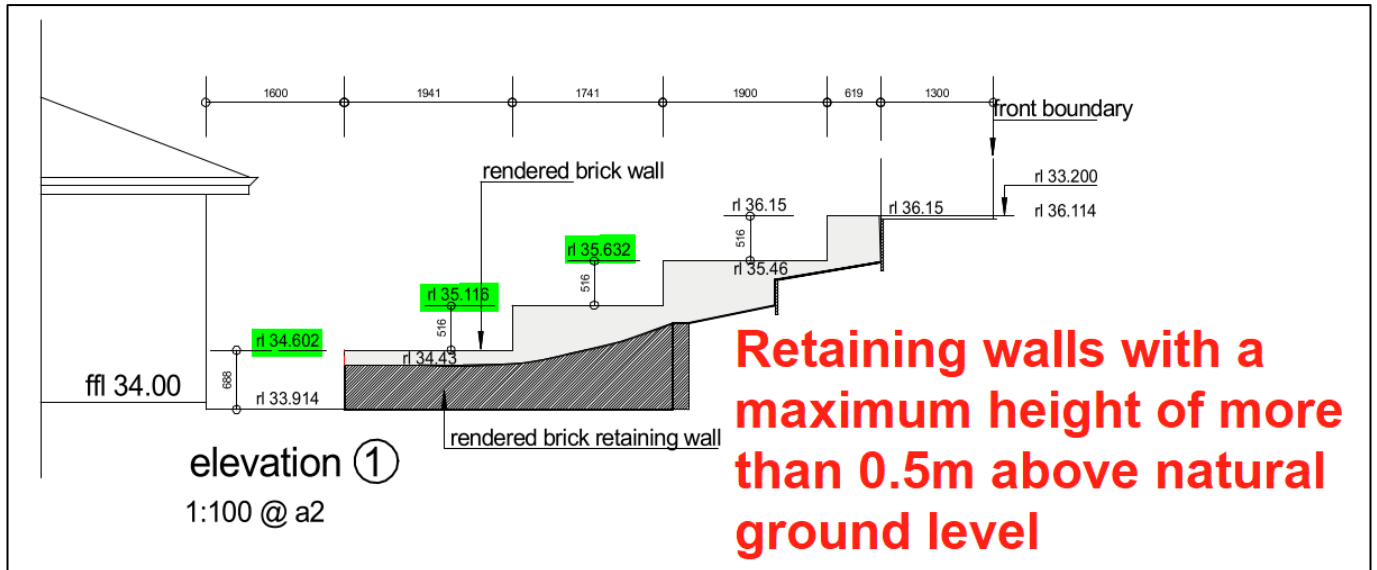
Marked-up elevation drawing showing the portions of the retaining walls that exceed 0.5m above the natural ground level.
